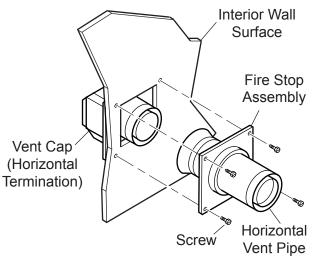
Connecting Vent Cap with Horizontal Vent Pipe
